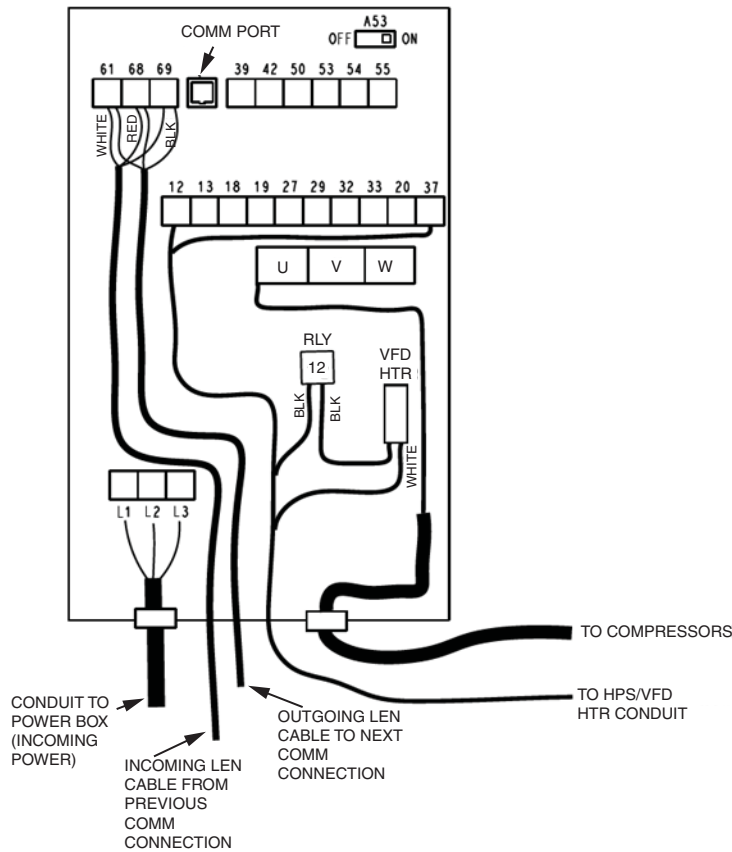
Compressor Drive Wiring, TU and TT Compressors
